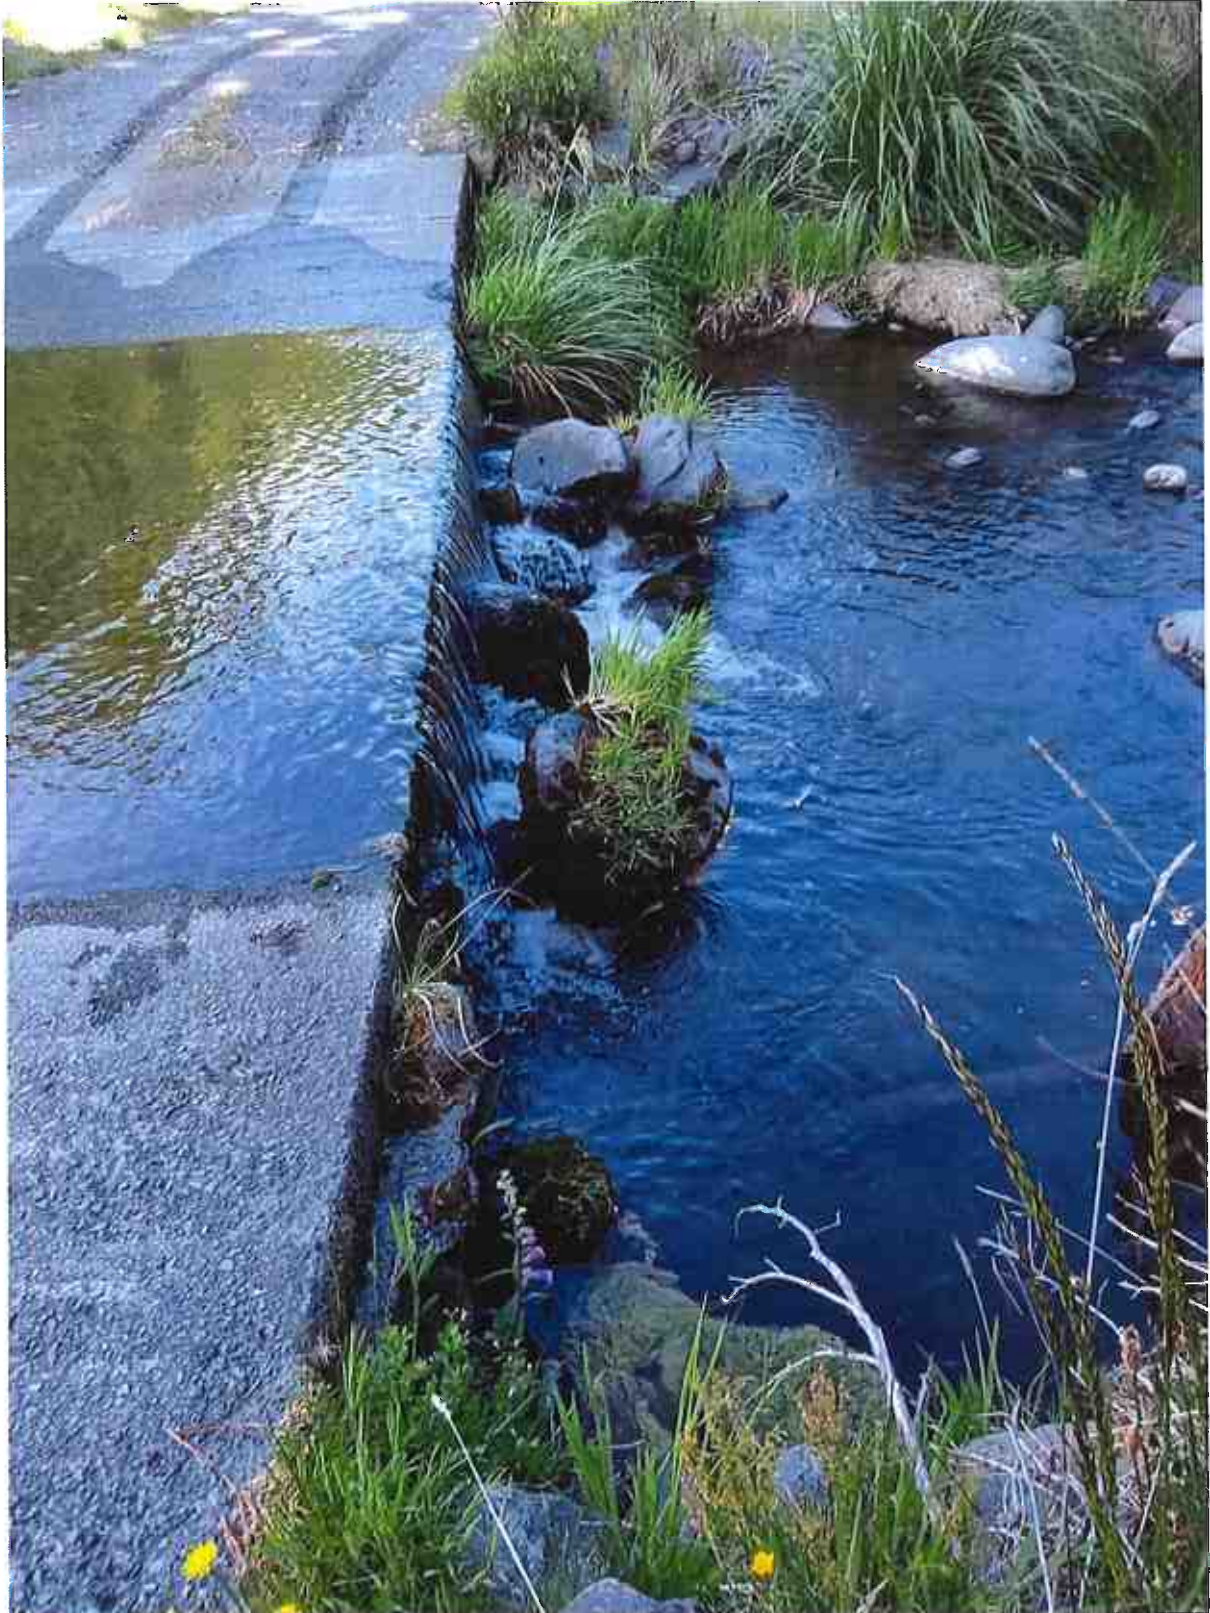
Tokiahuru Stream tributary at the Terrace Road ford (Site 9), showing the barrier to upstream fish passage, 5th December 2024.
